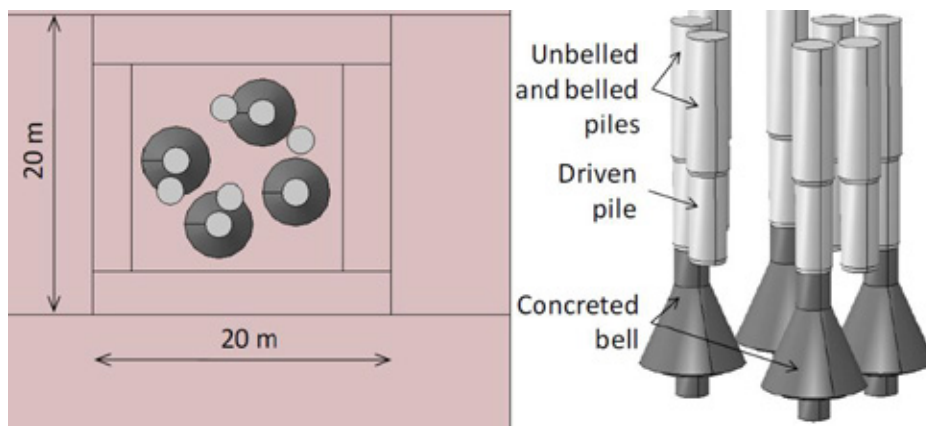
Remedial bell foundations installed at NRA (Senders et al. 2013)
